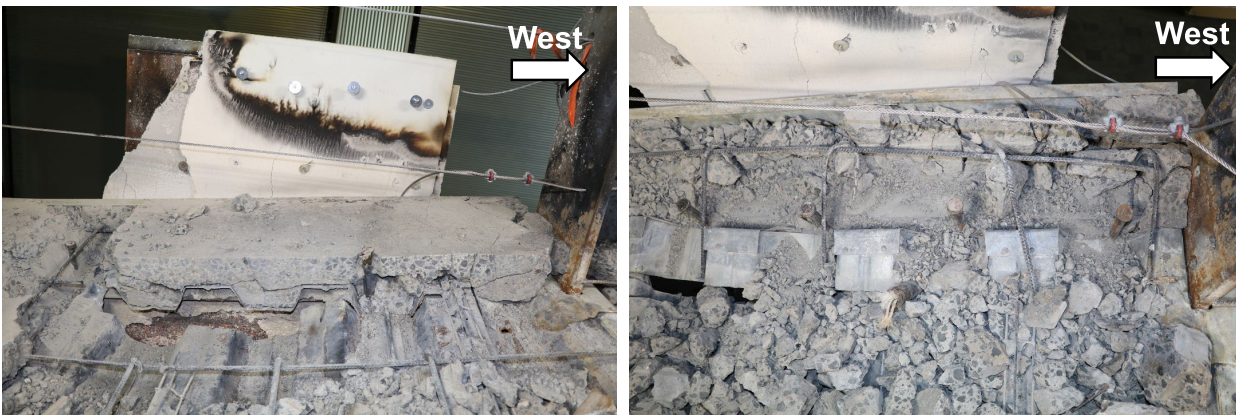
shows some post-test photographs of the fire damaged steel deck under the concrete slab. As shown, the test fire caused extensive damages to the steel decking across the entire test bay. As shown in Fig. 76, large steel deck ruptures developed in parallel to the secondary beam as well as at the west side of the slab, where bolt ruptures at the shear tab connection, at the west end of the secondary beam, was observed.
